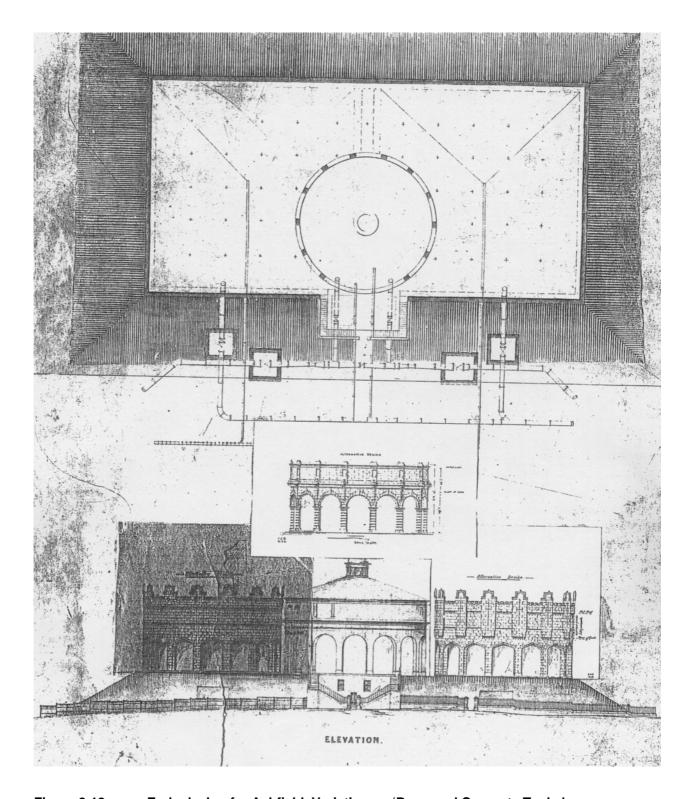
Early design for Ashfield, Variation on 'Proposed Concrete Tanks', 1908
